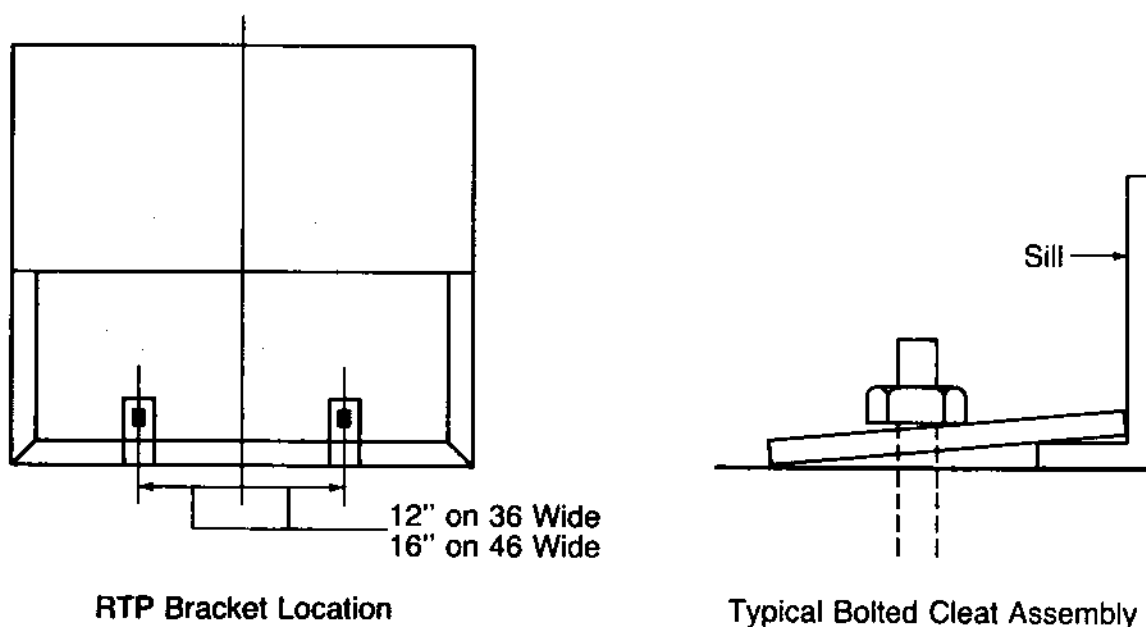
Typical Pad-Mounted Transformer Mounting Hardware
